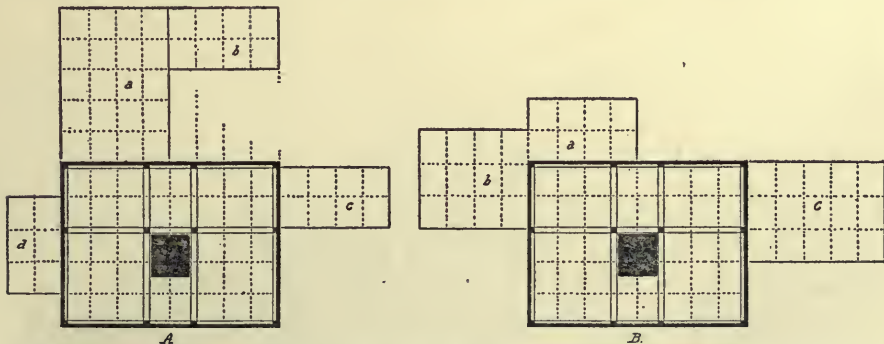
The "B" plan as divided by the big beams and showing the sub-divisions into units; also indicating the most plausible ways of addition, which covers as well the plan's later form "E," which has the same framing
